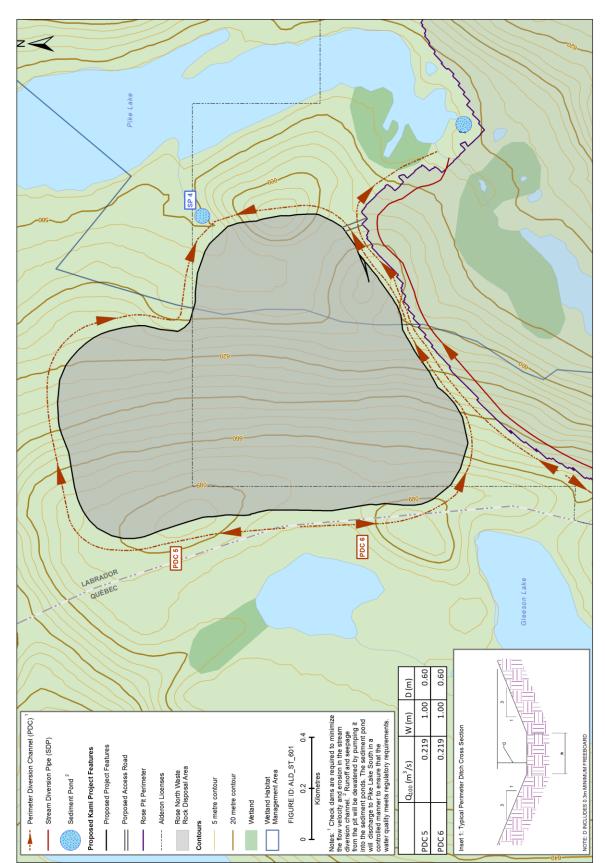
Rose North Waste Disposal Area Water Management Plan
